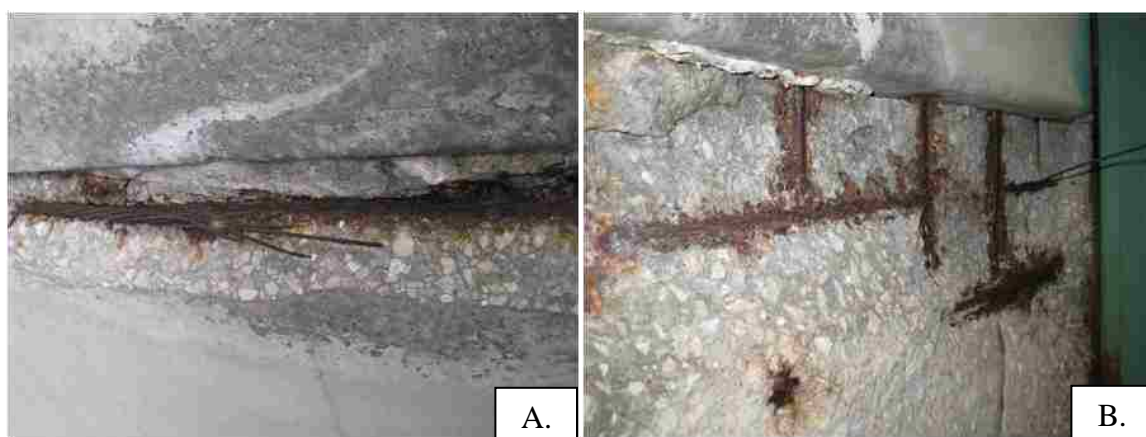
Ruptured tendons in spalled section (A. Partially ruptured tendon, B. Completely ruptured tendon) (Bridge A4067)
